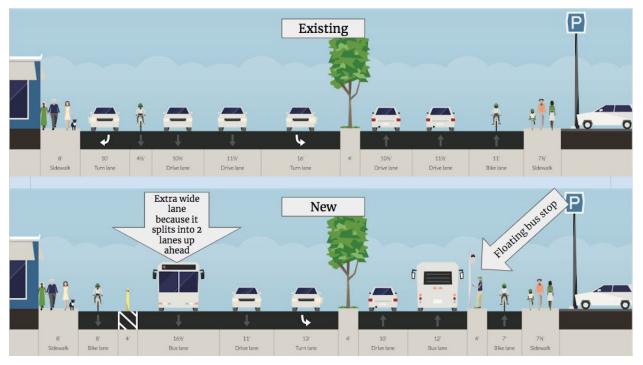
Current existing and new proposed recommended dimensions of Water Street at the Branciforte to Reed segment. Graphics developed using Streetmix.
